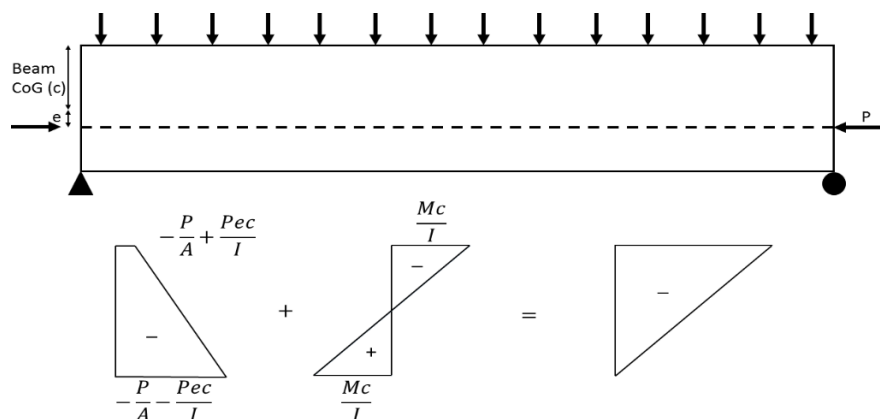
Stress Distribution in Prestressed Concrete Beams (Nawy 2009)
